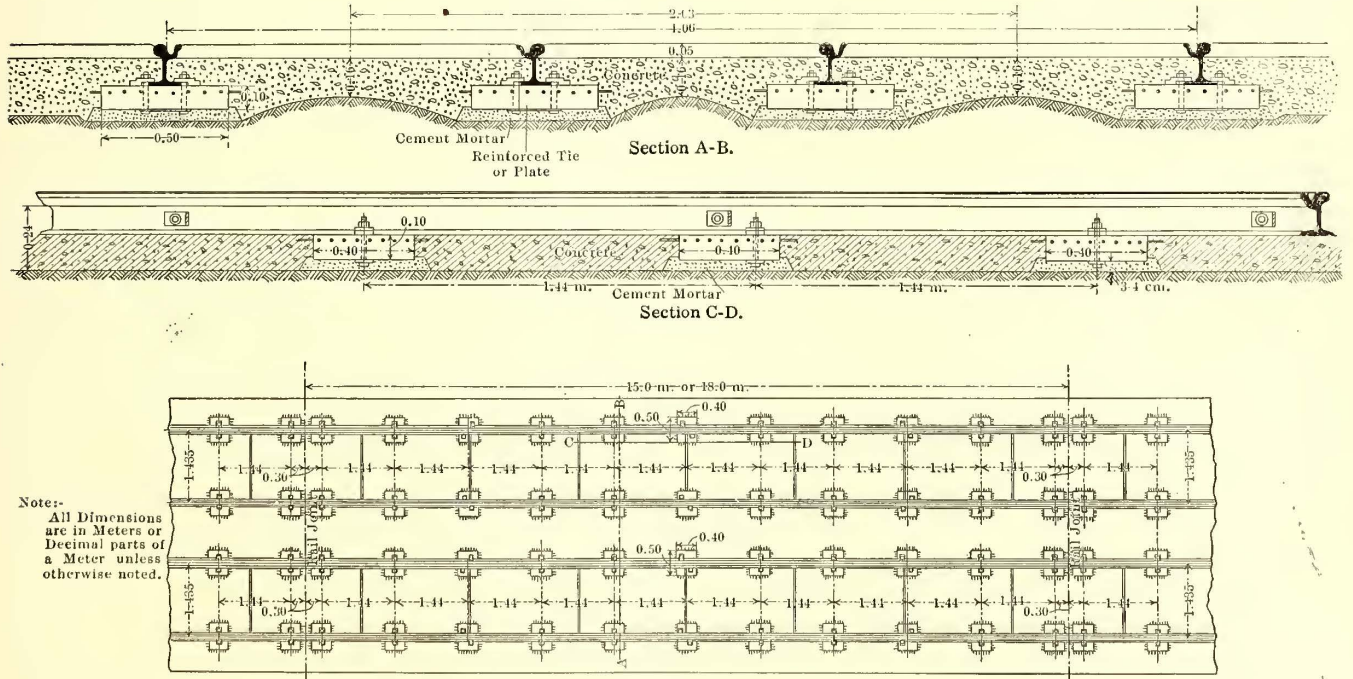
Berlin Concrete Track—Construction on Reinforced Concrete Ties
